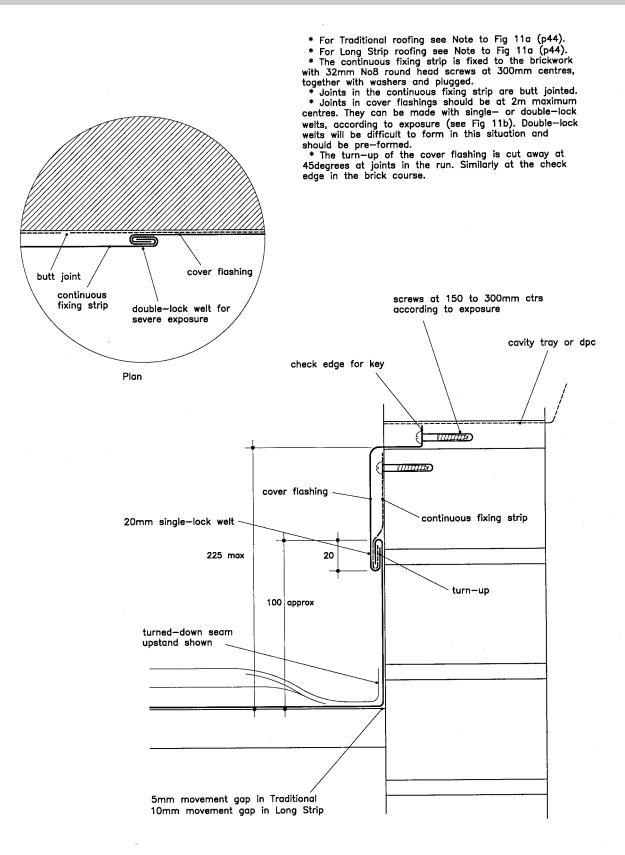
Vertical upstand 225mm max with horizontal cover flashing to brickwork TRADITIONAL / LONG STRIP X
